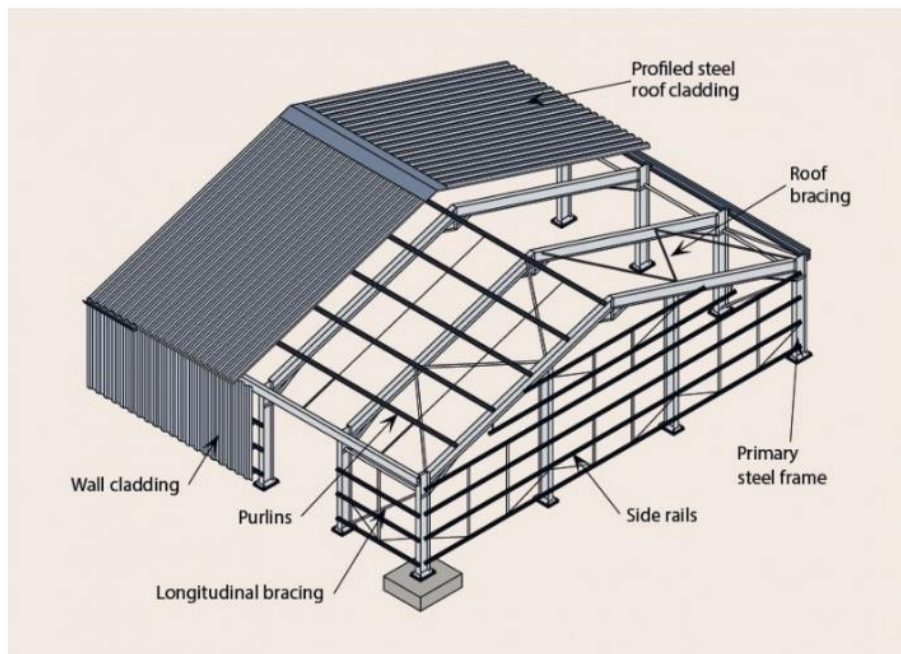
Principal components of a steel structure for single-storey buildings [3]
